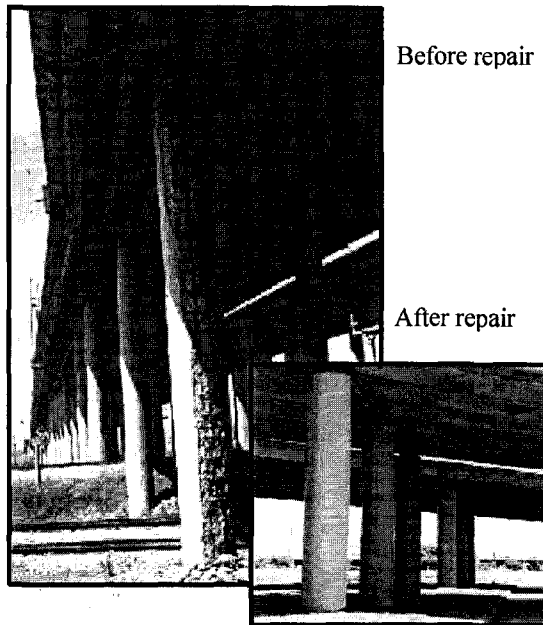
I-40 Bridge, Oklahoma (repair of corrosion damaged piers)
